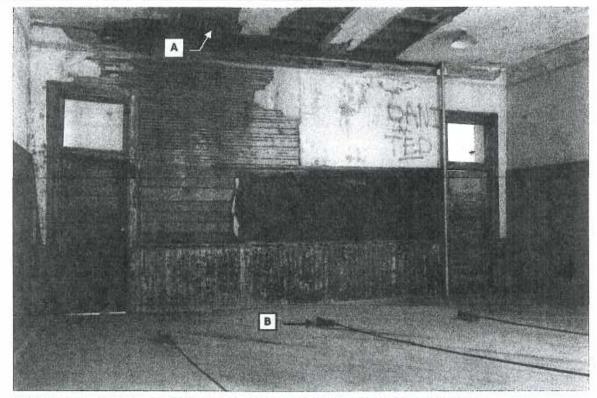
Room 9 view north. (A) Lath and plaster are missing from ceiling, (B) Cable tie-downs
